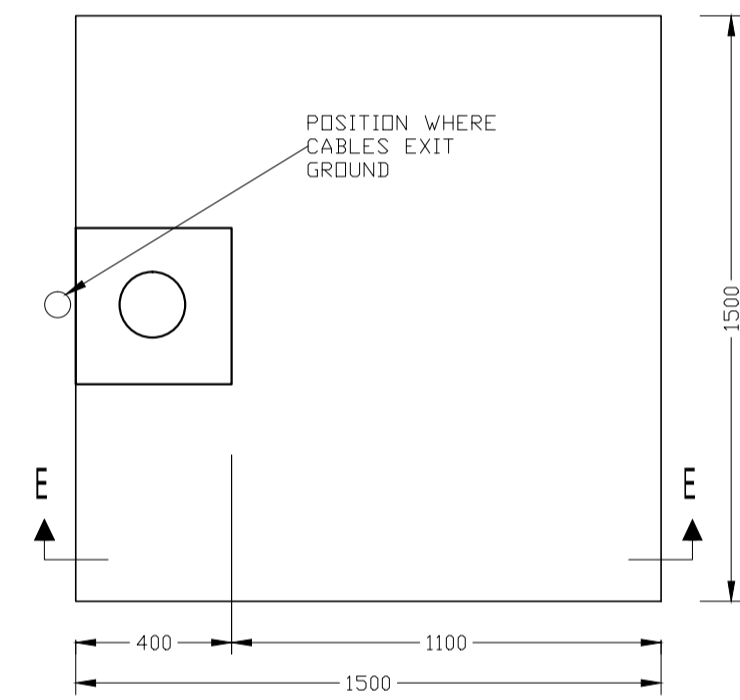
E: TYPICAL CABLE CONNECTIONS AND FIXING OF SIGNAL HEADS
